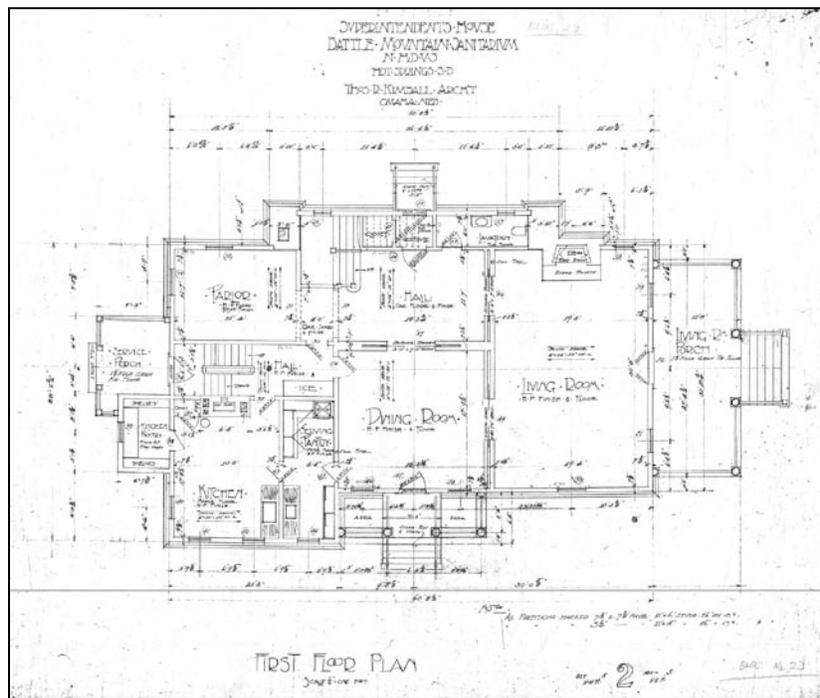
Thomas Rogers Kimball, First Floor Plan, "Superintendent's House," (October 1905)
